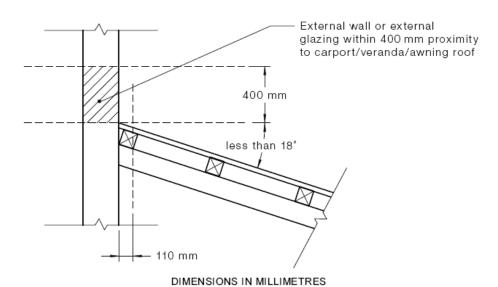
EXTERNAL WALLS OR EXTERNAL GLAZING, OR EXTERNAL DOORFRAMES WITHIN LIMITS ABOVE GROUND, DECKS, CARPORT ROOFS
